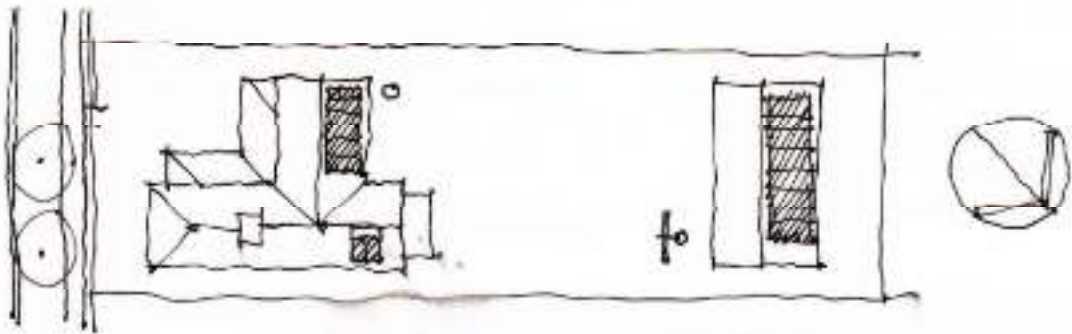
Solar panels should be located away from the front elevations and use ancillary buildings where possible. Solar tanks to be located at ground level and wind structures away from key elevations.
